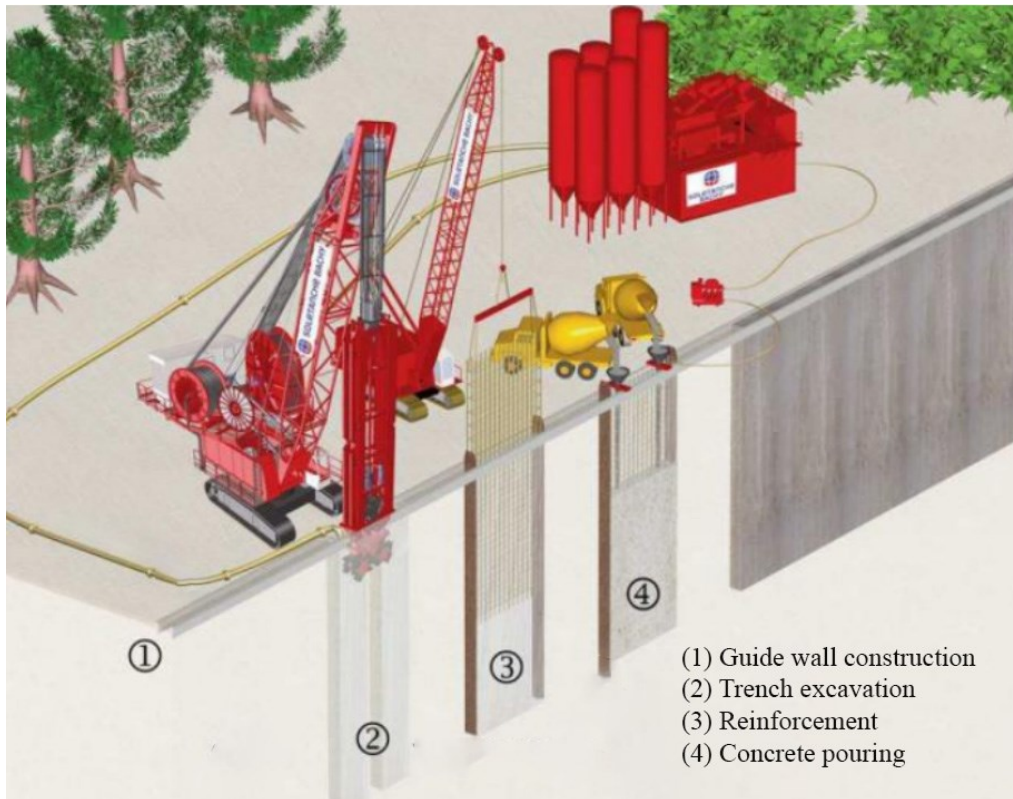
Diaphragm wall construction (RailSystem, 2021)
